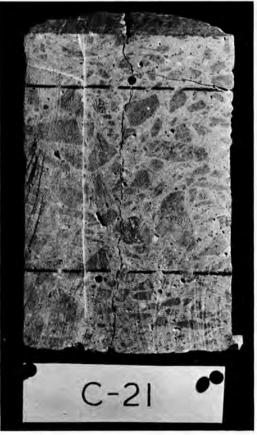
Core at crack in 10-in. section, Sta. 905+22.
